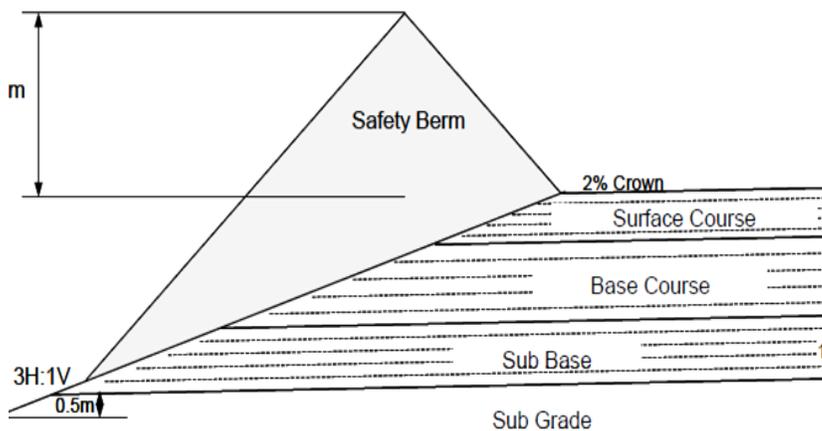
Typical haul road cross-section (Tannant & Regensburg, 2001)
